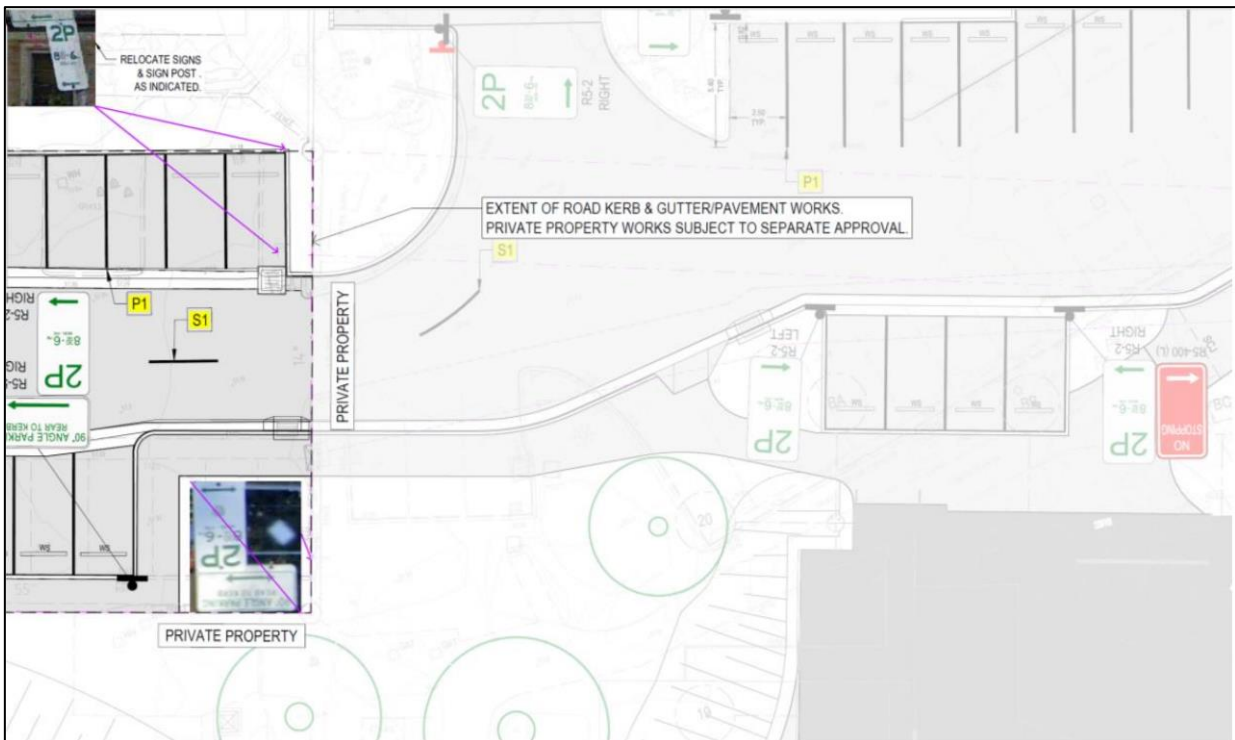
| Extract from civil engineering drawings showing modified car parking layout at the eastern end of Barber Avenue (Source: ptc)
